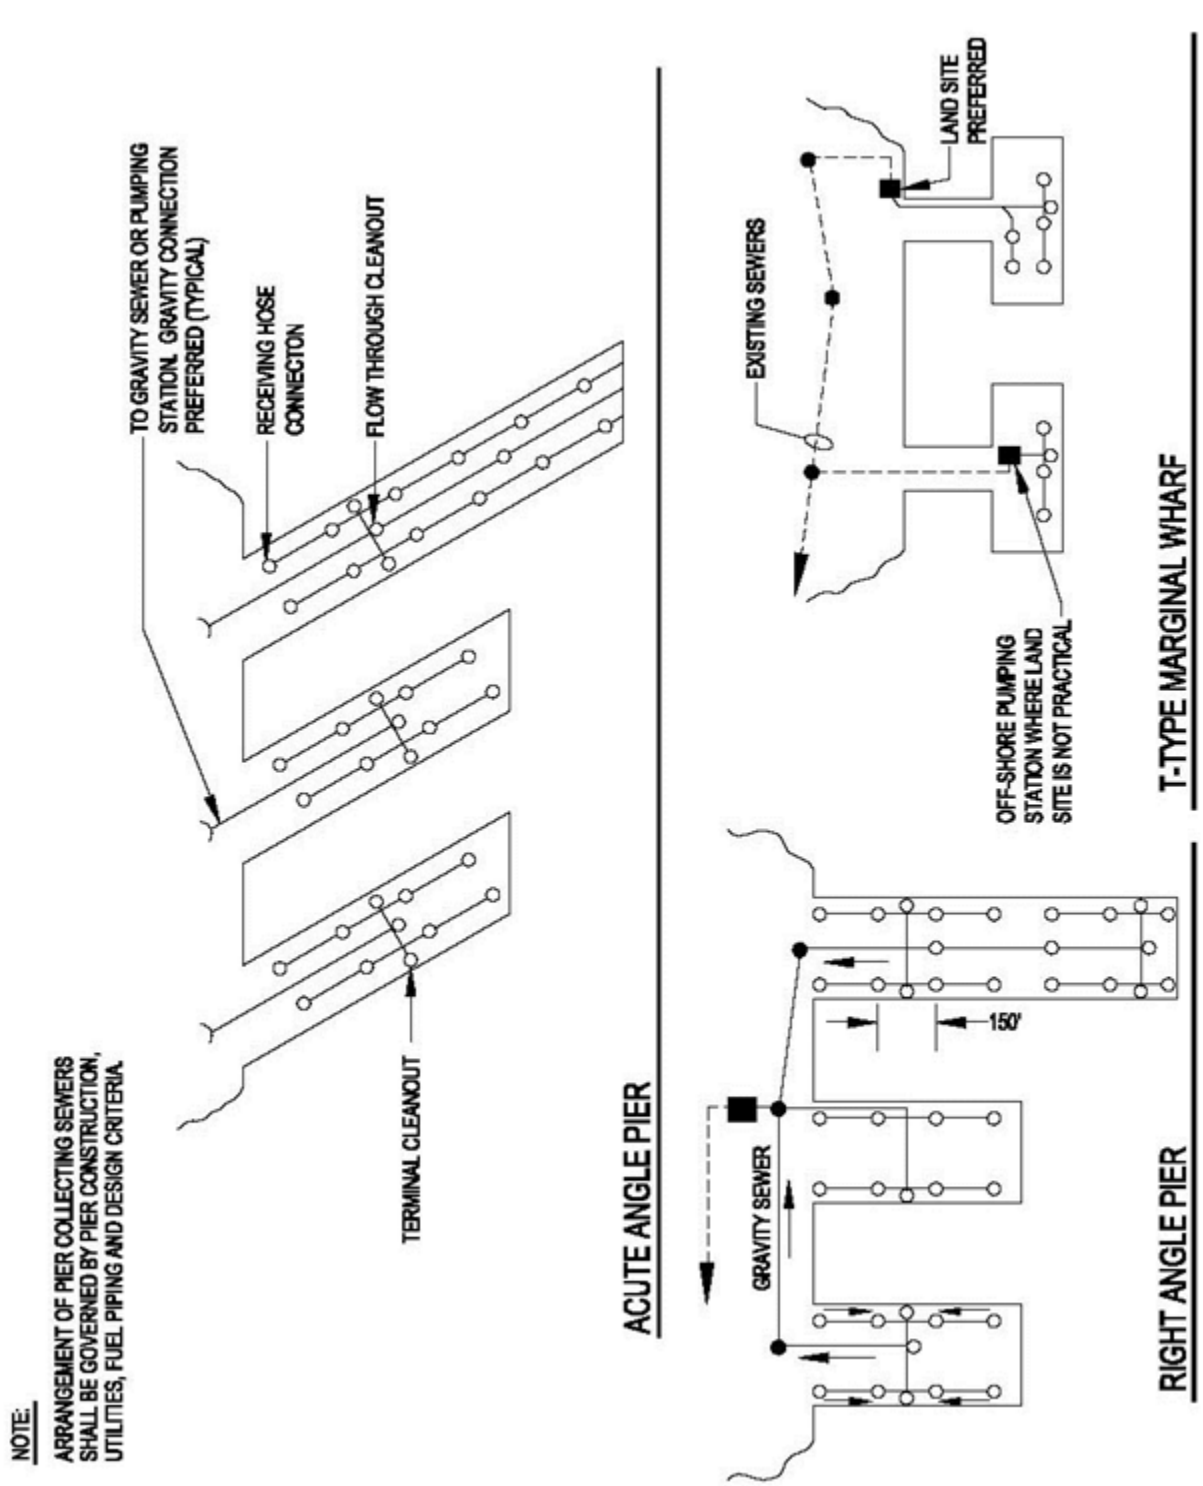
(b) Sewer Layout for Alternative Pier Types (2 of 2)
